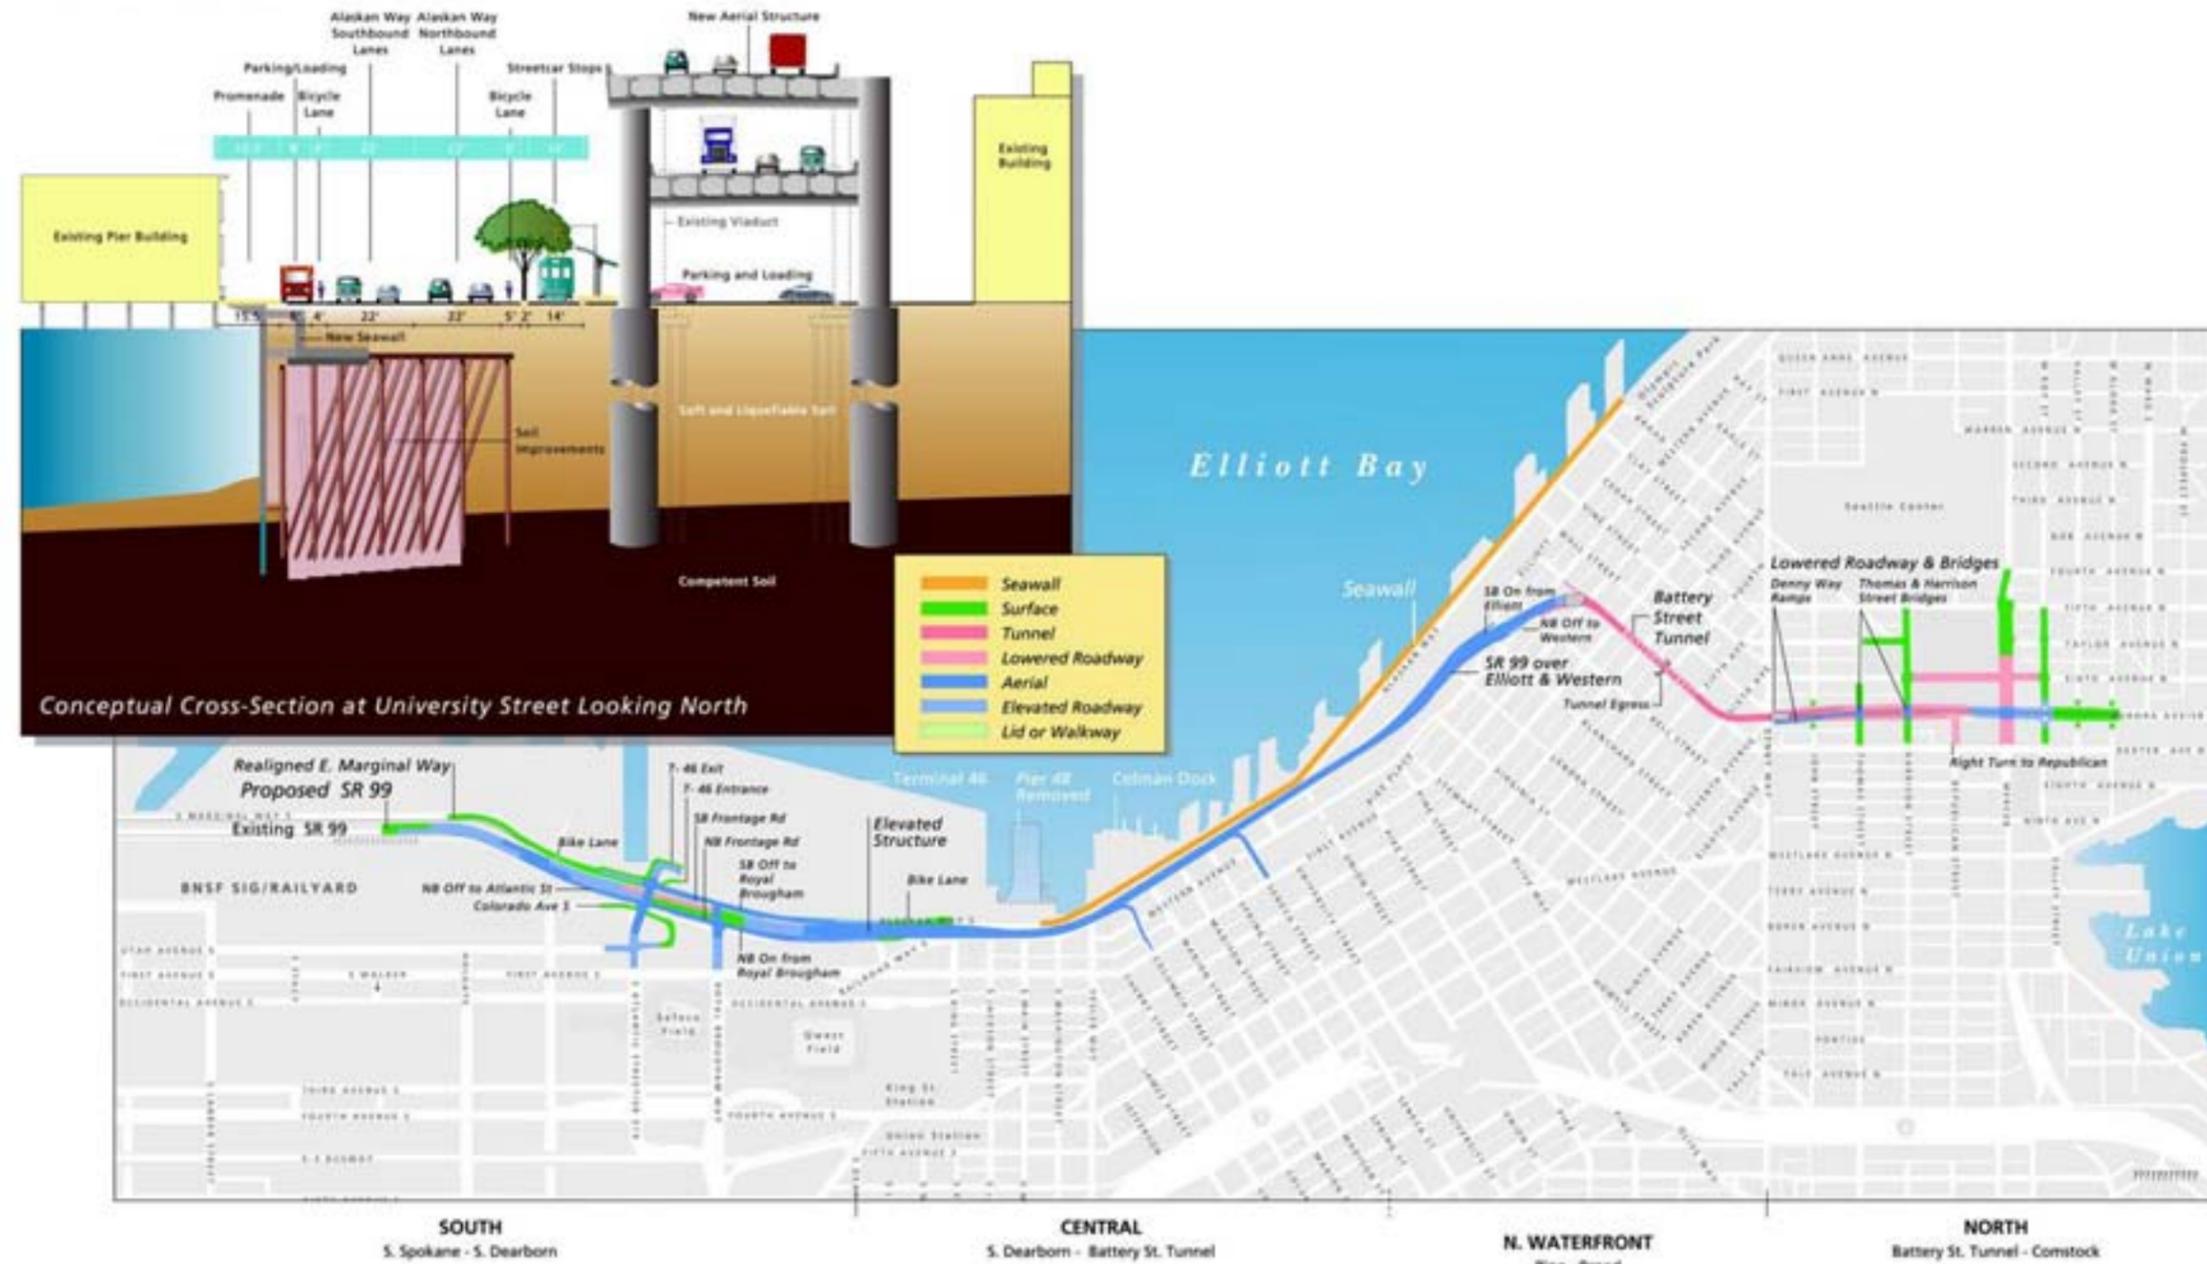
shows a map and cross section of the Elevated Structure Alternative.
